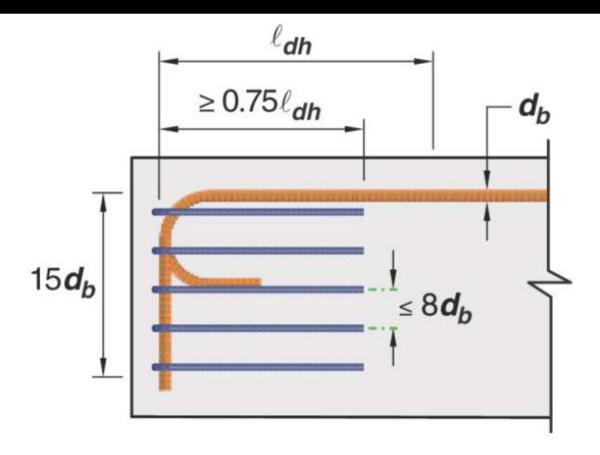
Confining reinforcement placed parallel to the bar being developed that contributes to anchorage strength of both 90- and 180-degree hooked bars.
